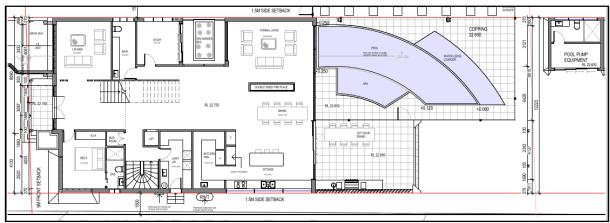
Amended ground floor plan, received by Council 1 September 2021.
